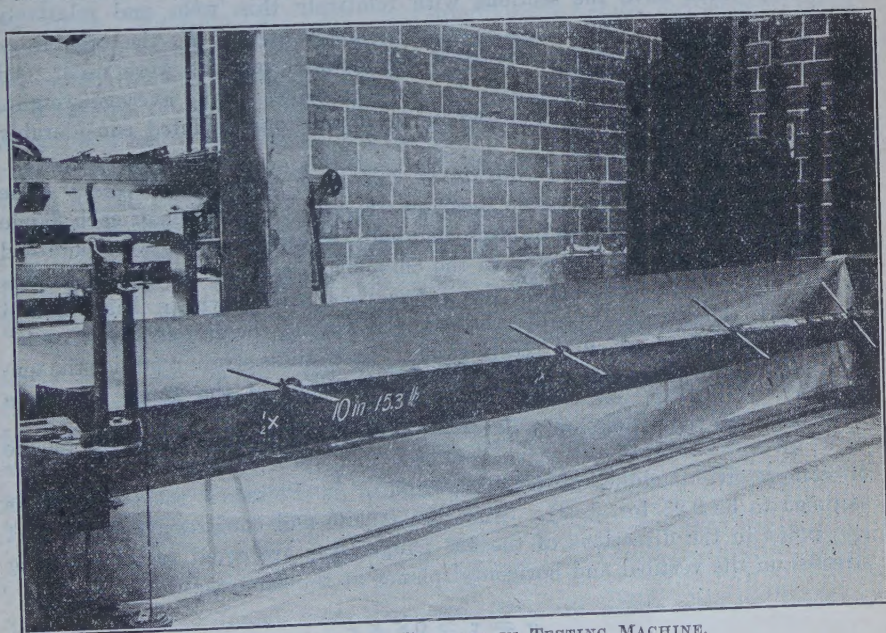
VIEW OF CHANNEL IN TESTING MACHINE.
